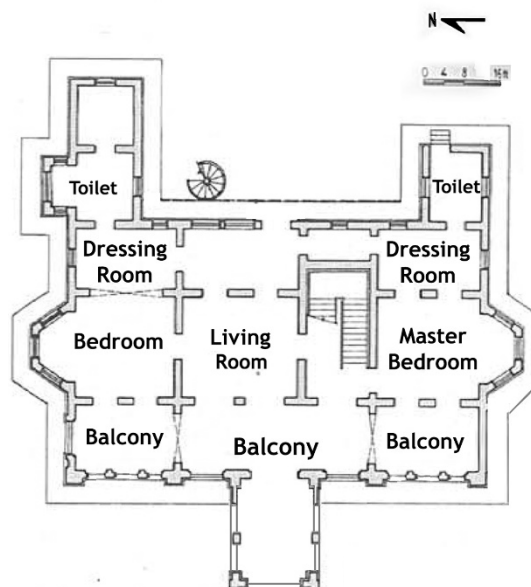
First Floor Plan of Flagstaff House. (Lari & Lari, 2001, p. 310)
